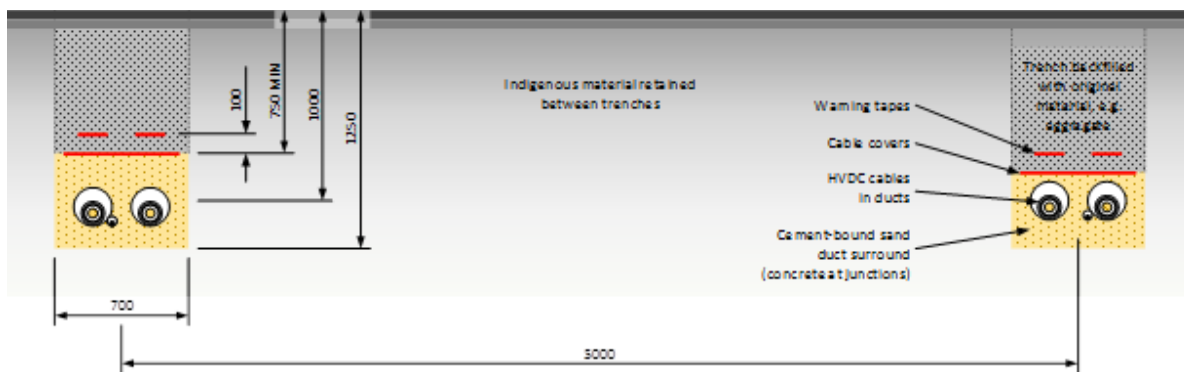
Typical Arrangement of HVDC Cable in Road, Verges and Footpaths (all measurements in mm)
